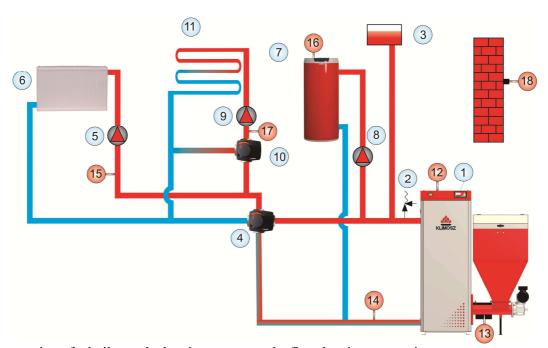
Connection of a boiler to the heating system and a floor heating system in an open arrangement system.
